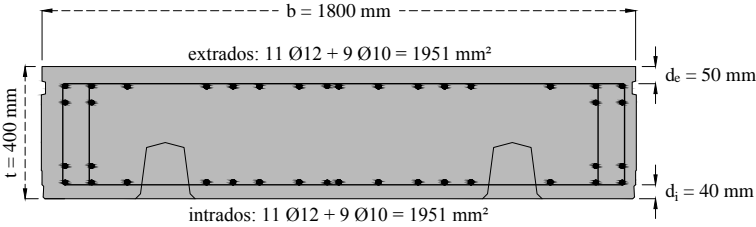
Cross-section of a tunnel segment and positioning of reinforcement bars.
